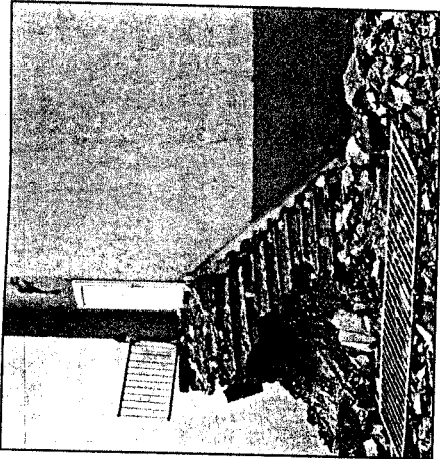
Emergency exit obstructed by debris from URM infill failures
